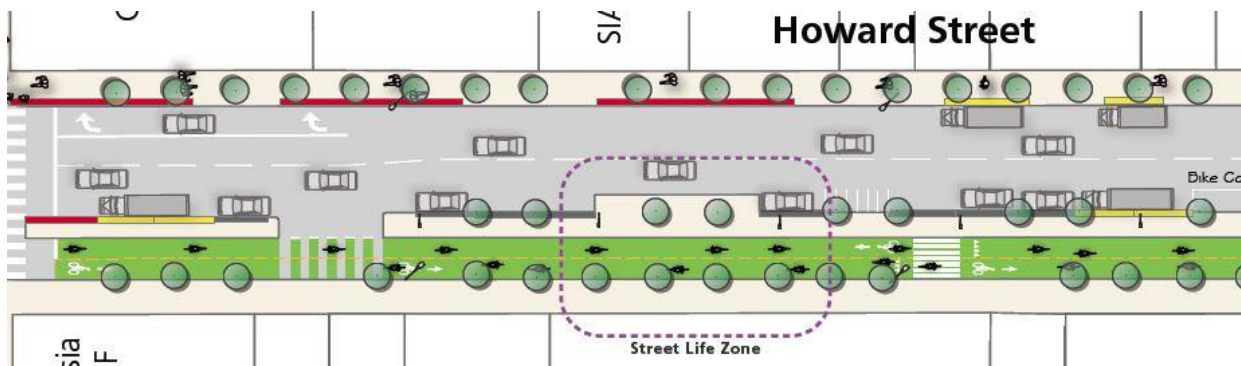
Typical Plan View of Howard Street between 11th Street and 5th Street
